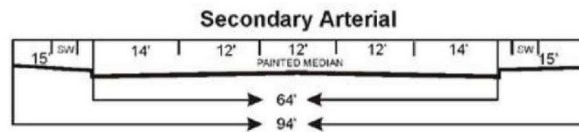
CITY OF PERRIS GENERAL PLAN ROADWAY CROSS-SECTIONS
